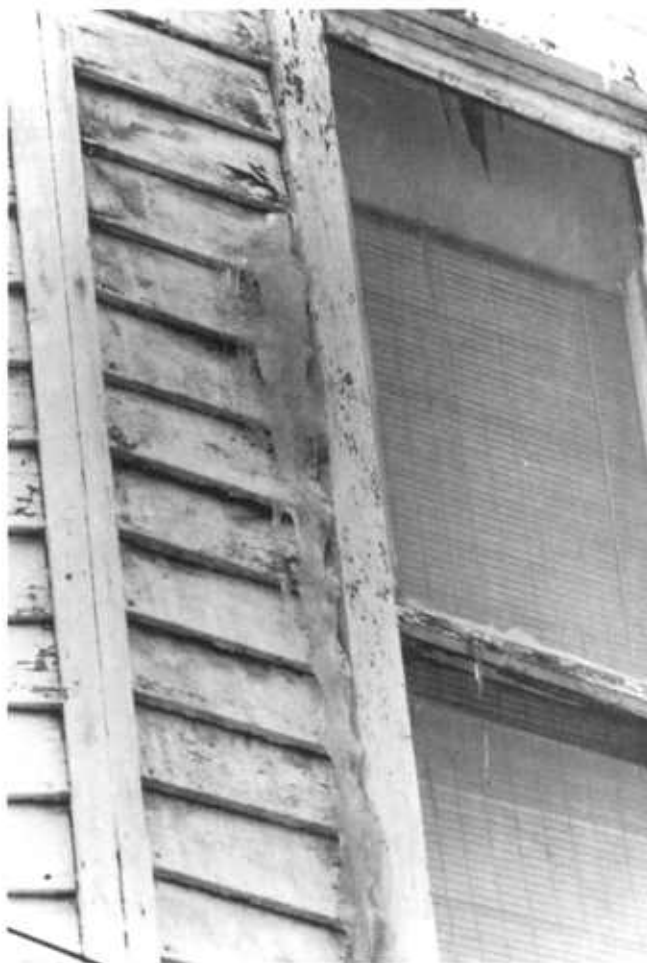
Cold weather condensation on a house without a vapor barrier on interior walls. Paint blistering, peeling, and wood decay are likely.
